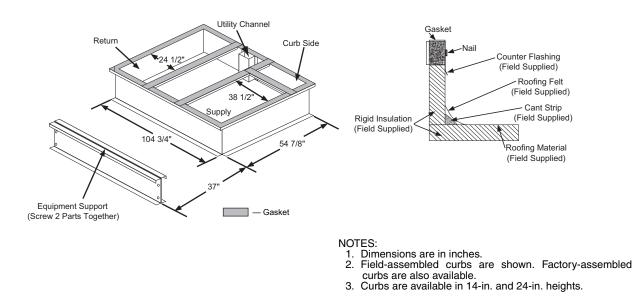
Accessory Dimensions — 62RA,RB,RC,RD22-38 Roof Curb
